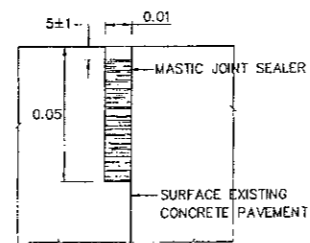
DETAIL OF SAWED FOR LONGITUDINAL JOINT
